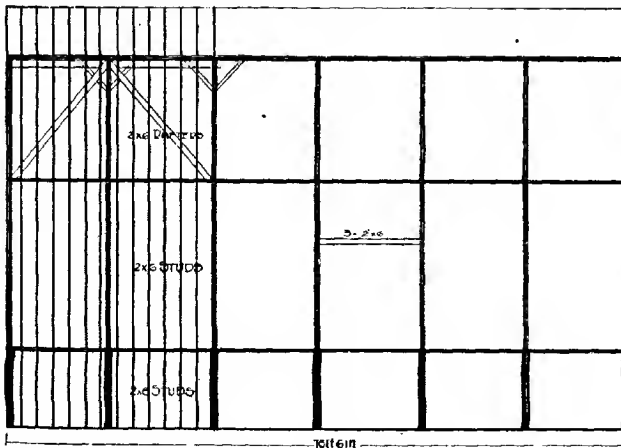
SHOWING CONSTRUCTION OF PLANK-FRAME BARN, SIDE VIEW
